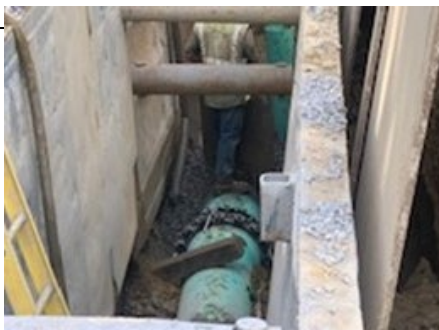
Installation of the 20-inch PVC Sewer Force Main with Restrained Joints on Auburn Street
